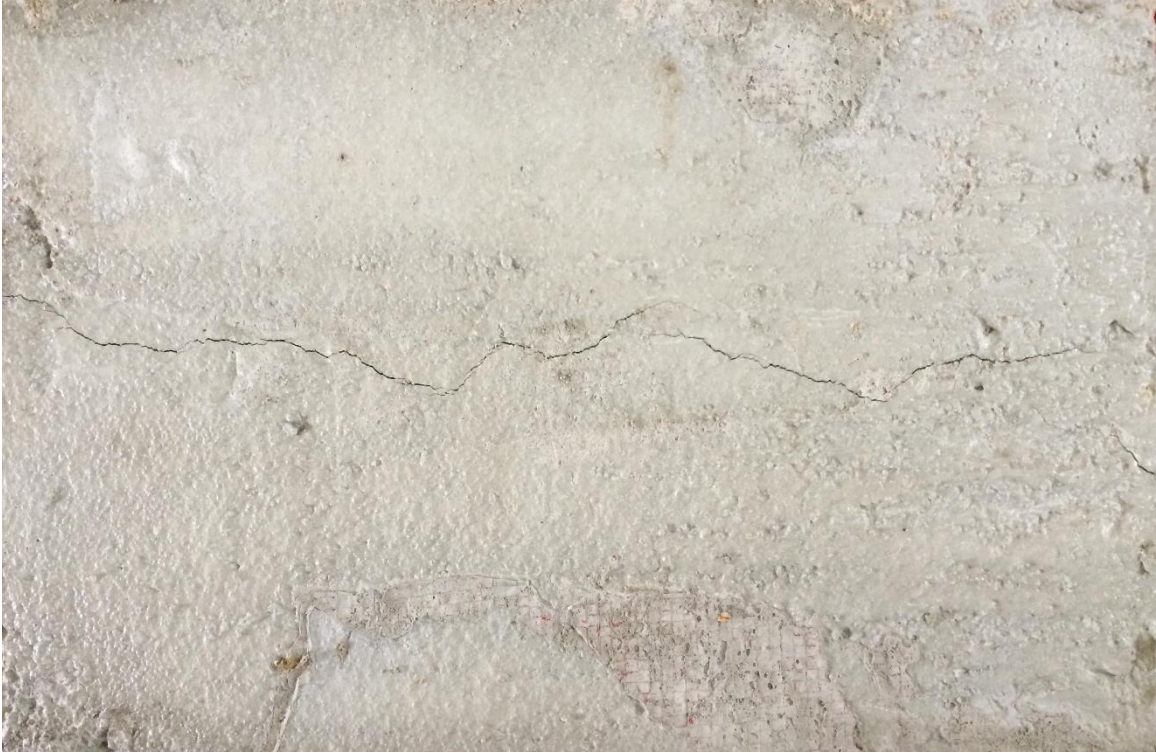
Longitudinal Crack Pattern of Beam I (C = 20 mm)
